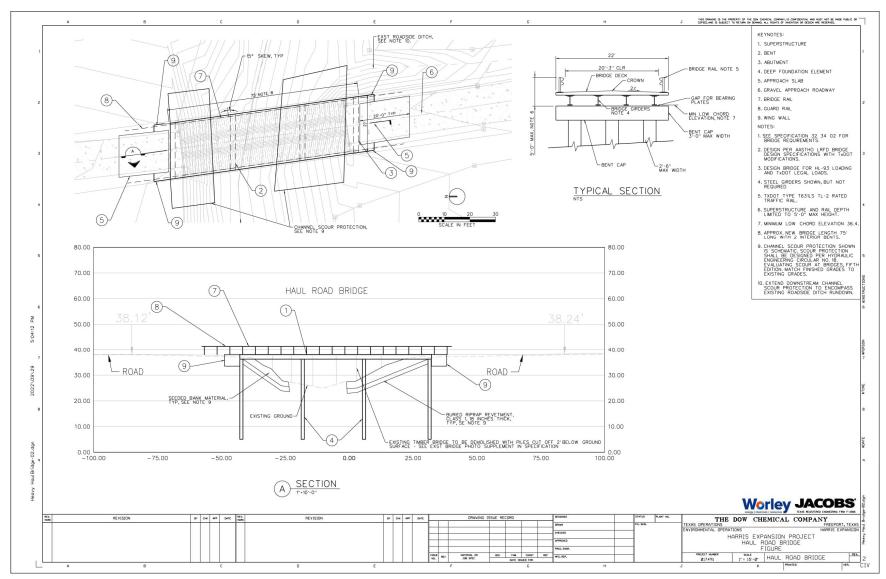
Existing Bridge and Proposed Haul Road Bridge
